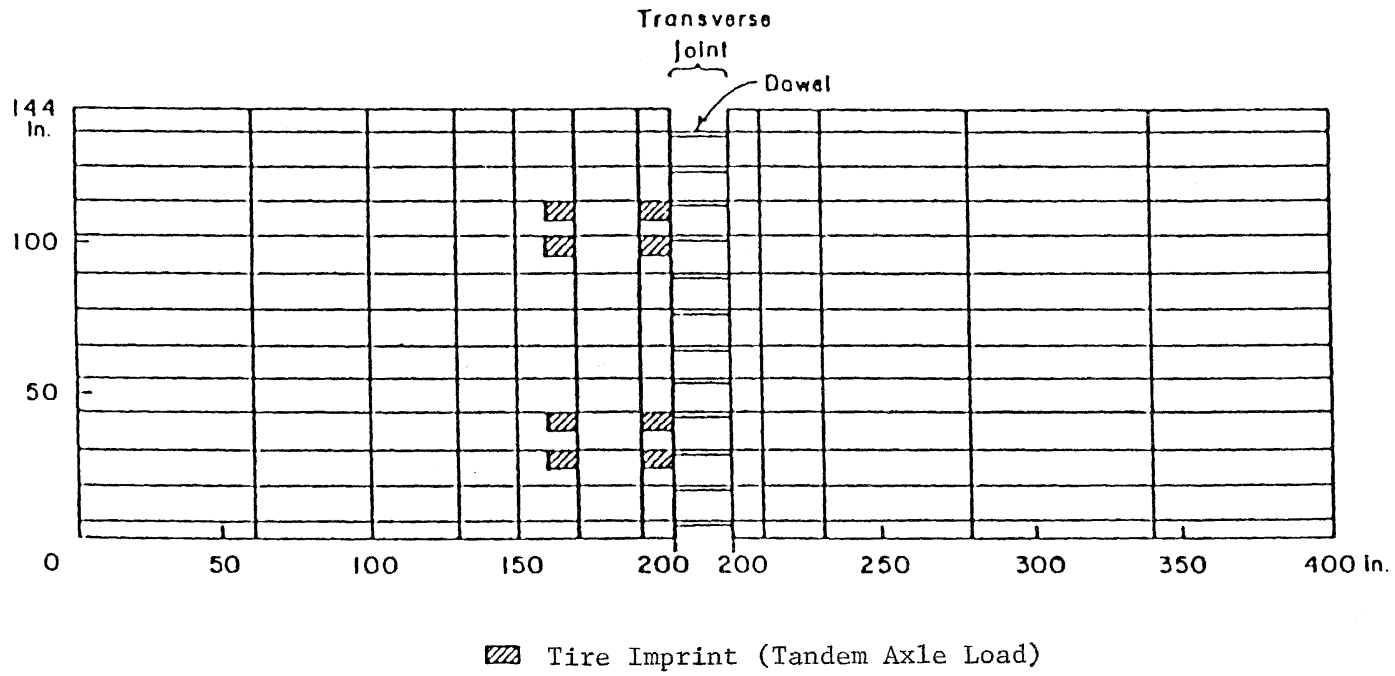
Finite Element Representation of Jointed Slab System.
